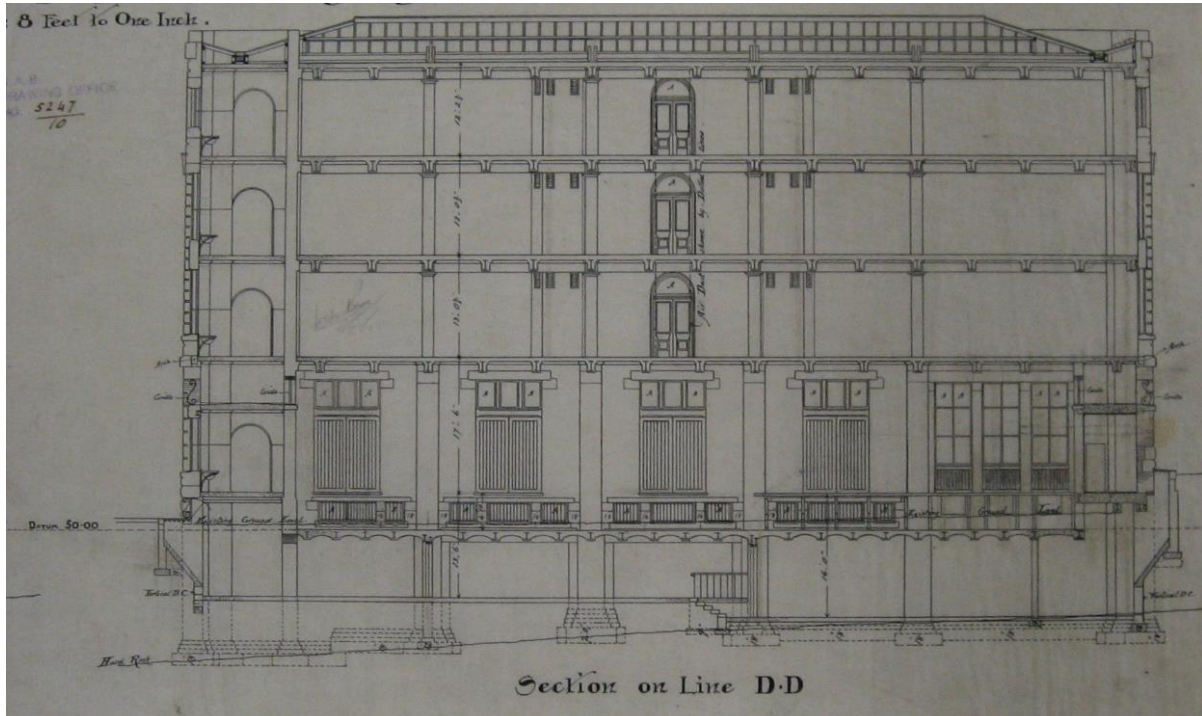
Detail from Sheet 5, Section on Line D-D: New Parcels Post Office Premises at the Central Railway Station Sydney, 1910 (showing the original four storey elevation).
